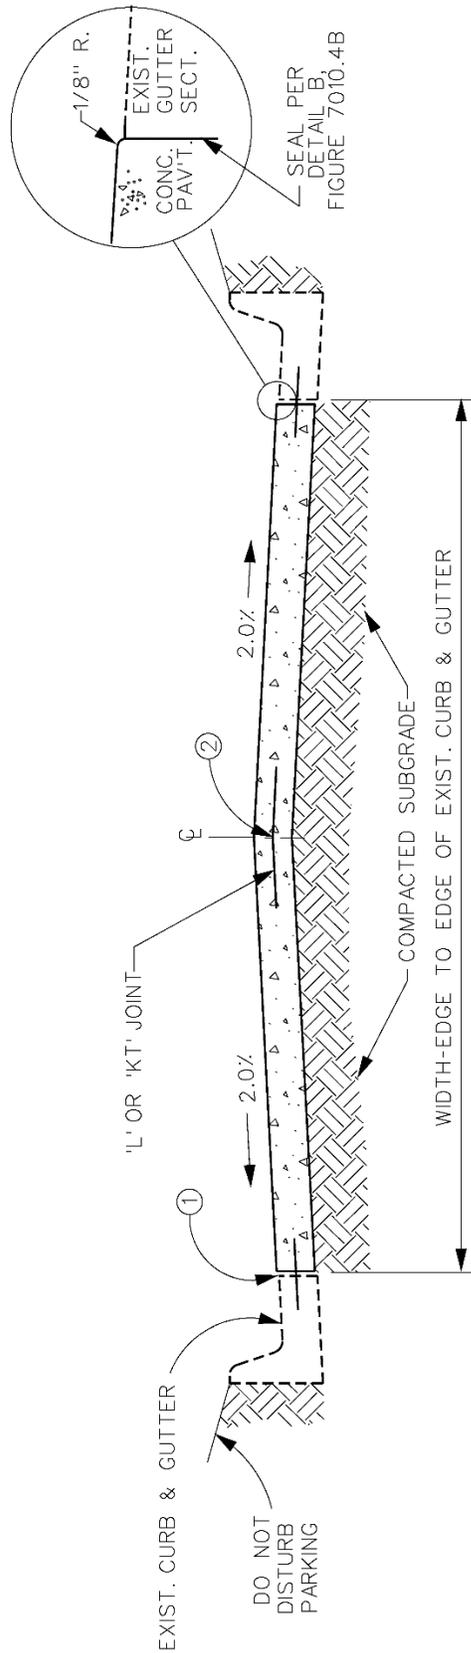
G-2.15: PCC Pavement Section Between Existing Curb and Gutter
